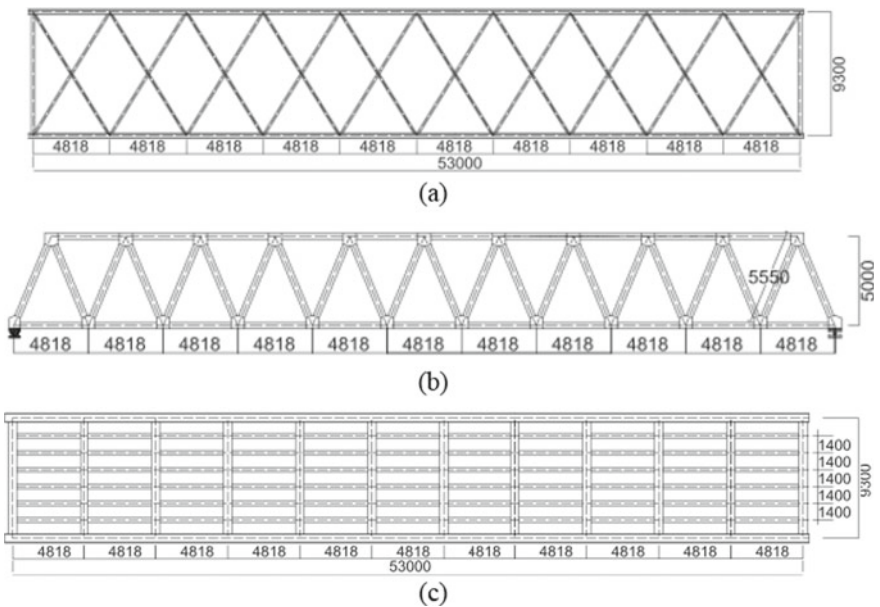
Prototype bridge: a top view, b side view, c bottom view
